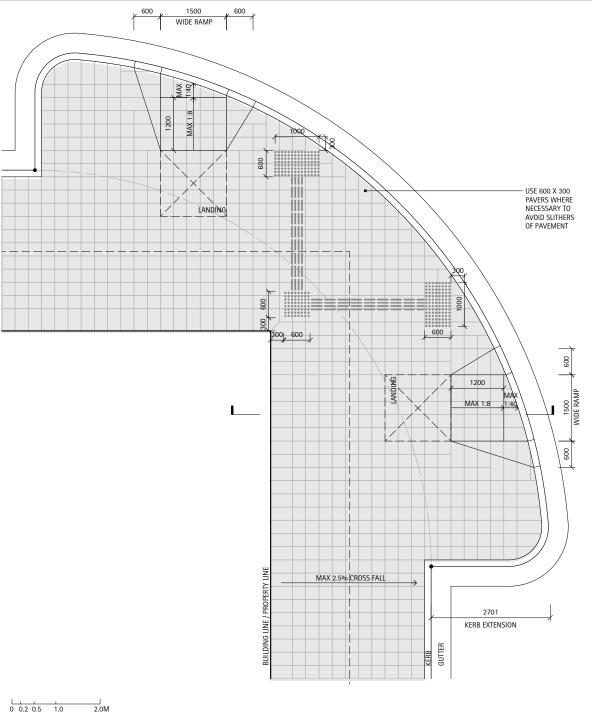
Streets Corner Plan: Kerb Extensions 1500 Ramp
